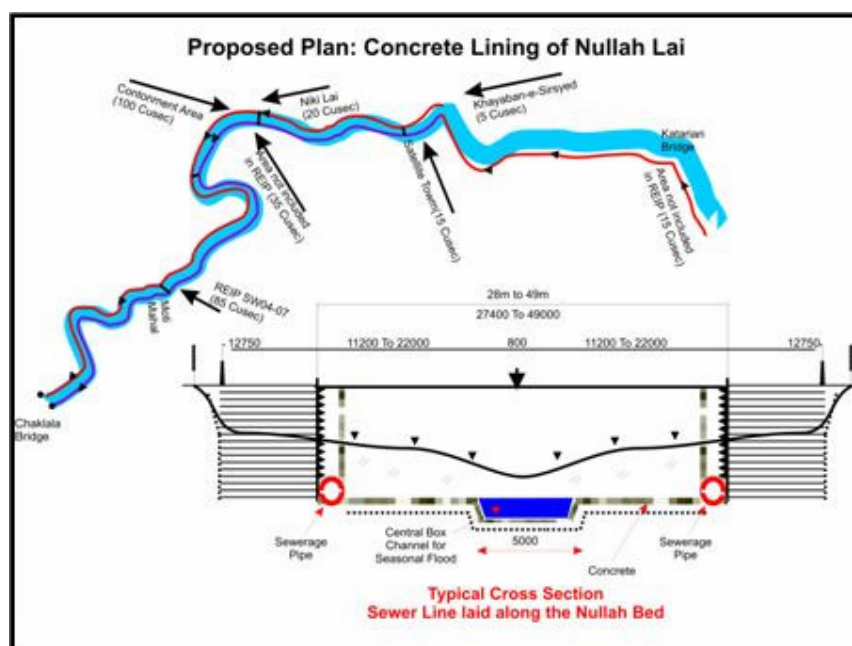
Plan View and Cross section - Concrete Lining of Nallah Lai (Wastewater Drain)
